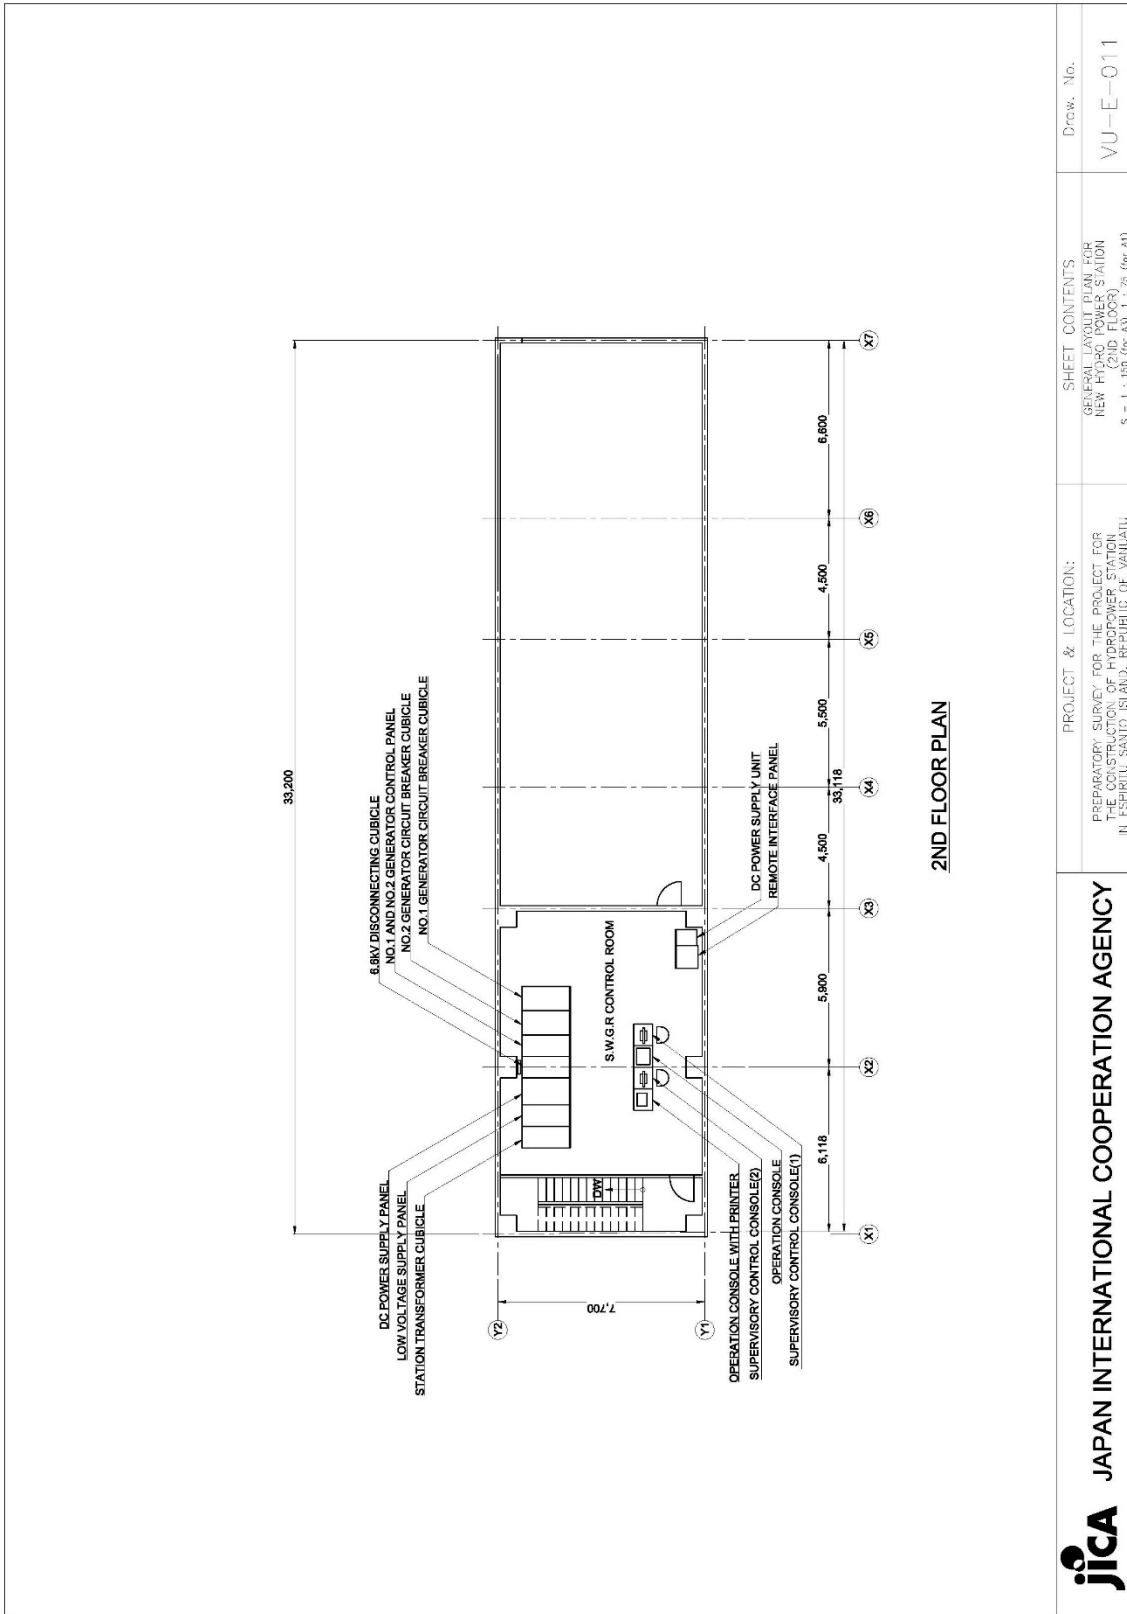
Layout of the New Powerhouse (2nd floor)
